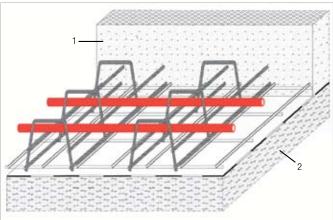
Floor panel reinforced with steel grids; special construction heating pipes assembled at the centre of the plate
